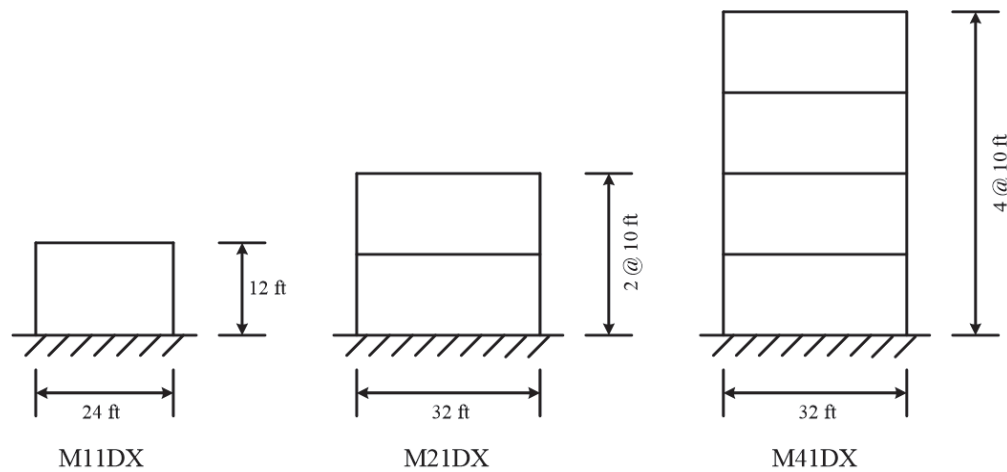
Dimensions of the special reinforced concrete masonry shear wall systems
